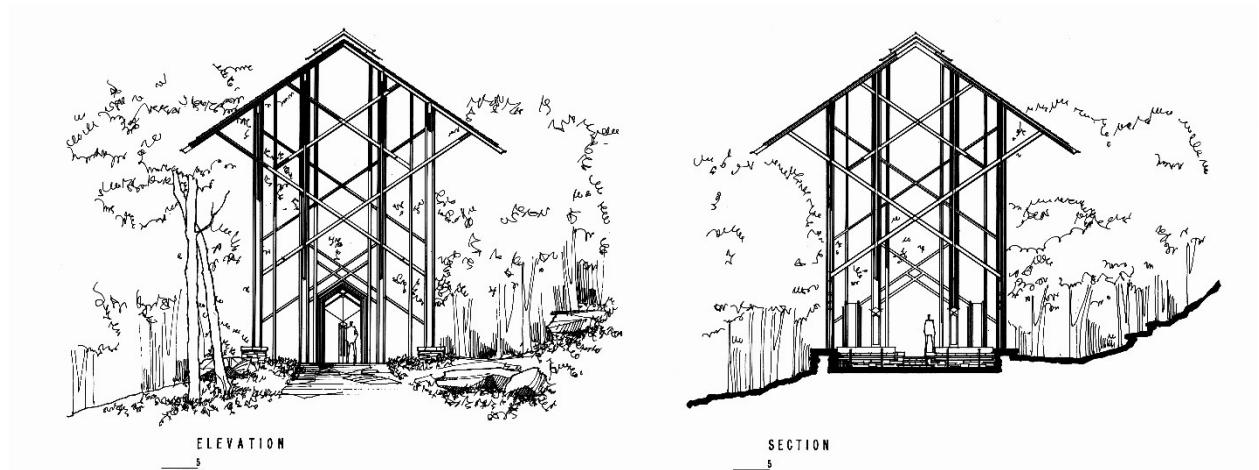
E. Fay Jones, elevation and section drawing, Eureka Springs, AR, 1980.²³
